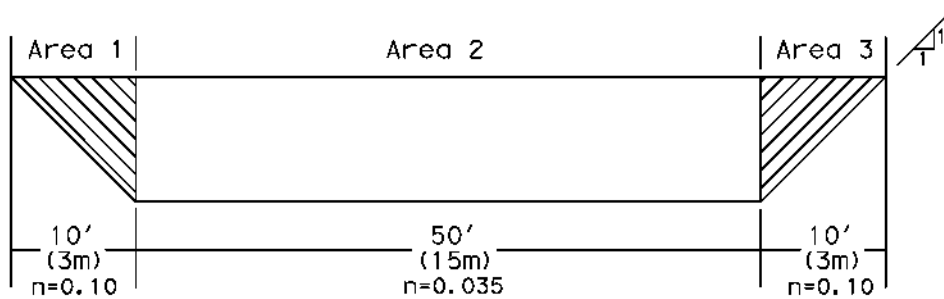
Subdivision of a Trapezoidal Cross Section
